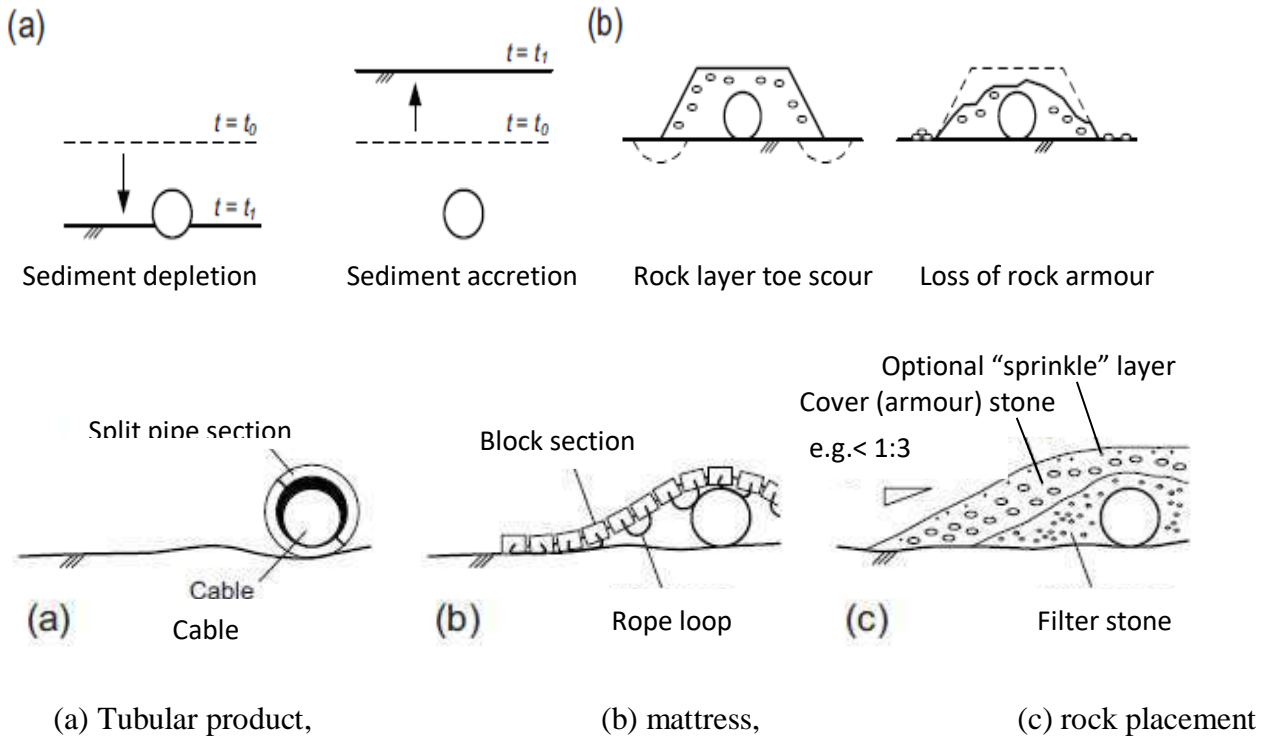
Examples of failure mechanisms of subsea power cable protection. (a) Burial, (b) rock placement [17].
